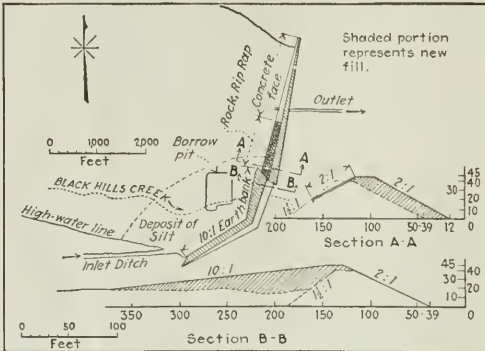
PLAN AND SECTIONS SHOWING REPAIRS
